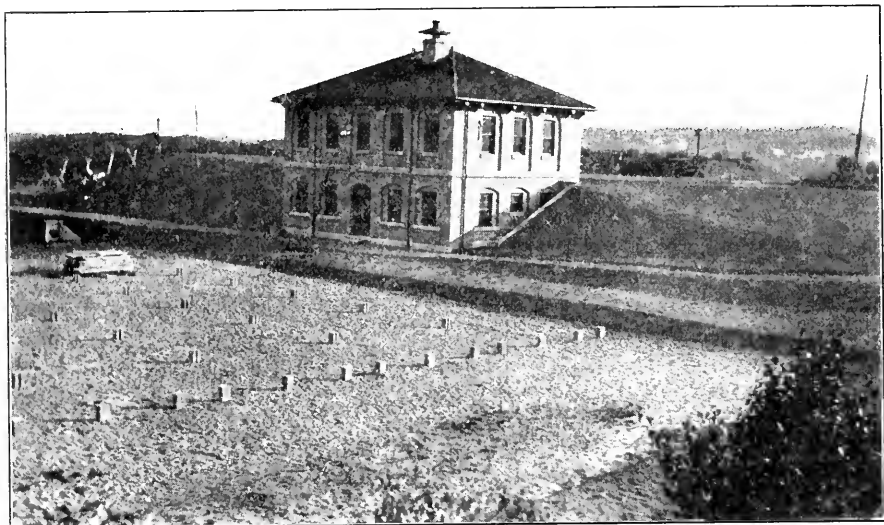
LABORATORY BUILDING AND SLUDGE BED.
